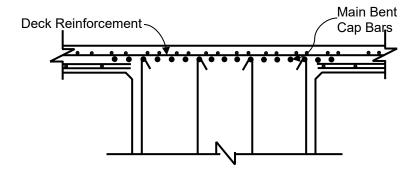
Typical Bent Cap Reinforcement (Skew ≤ 20°)
